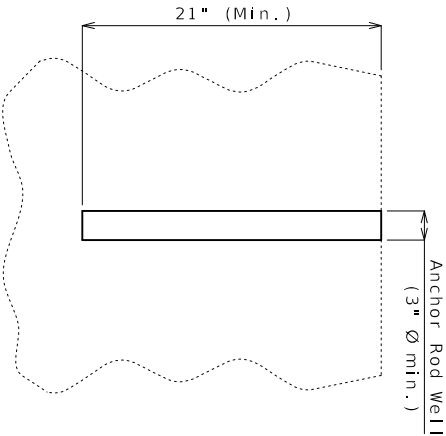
/4"Ø THRU 2 1/2"Ø ANCHOR BOLTS
